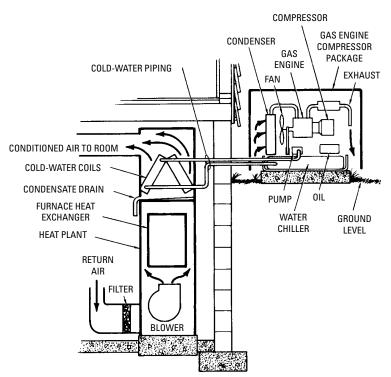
Cold-water coil used with outdoor gas engine compressor. (Courtesy Honeywell Tradeline Controls)
